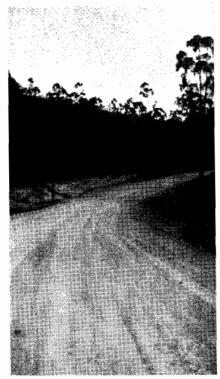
Showing old road crossing new road at Two Mile Creek.
